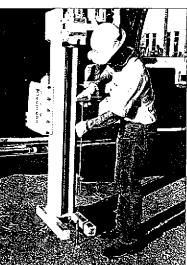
Rotate extension rod handle clockwise to disengage Stop-Pin.
